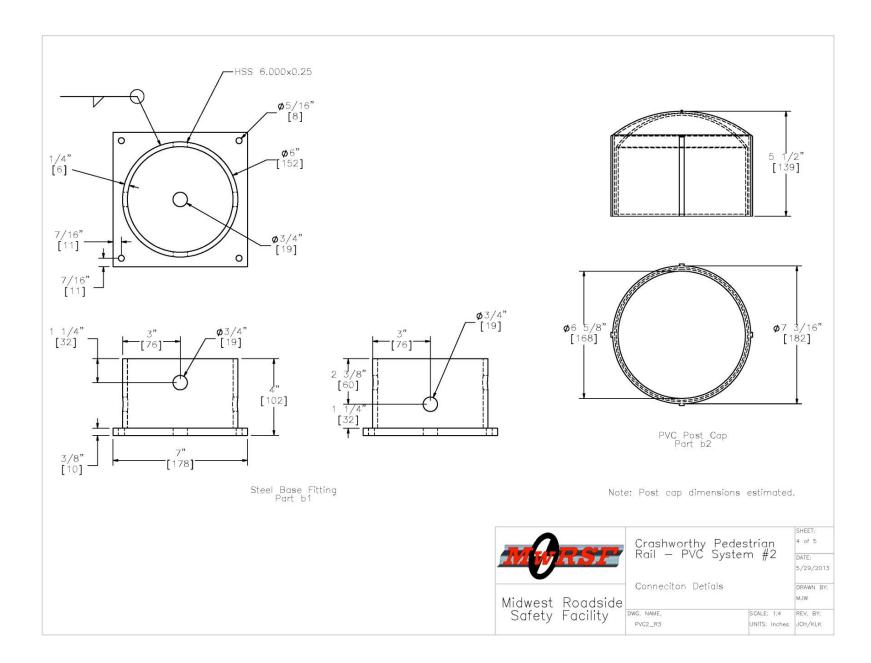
Modular PVC Rail, Design Concept PVC2-b (Sheet 4 of 5)
